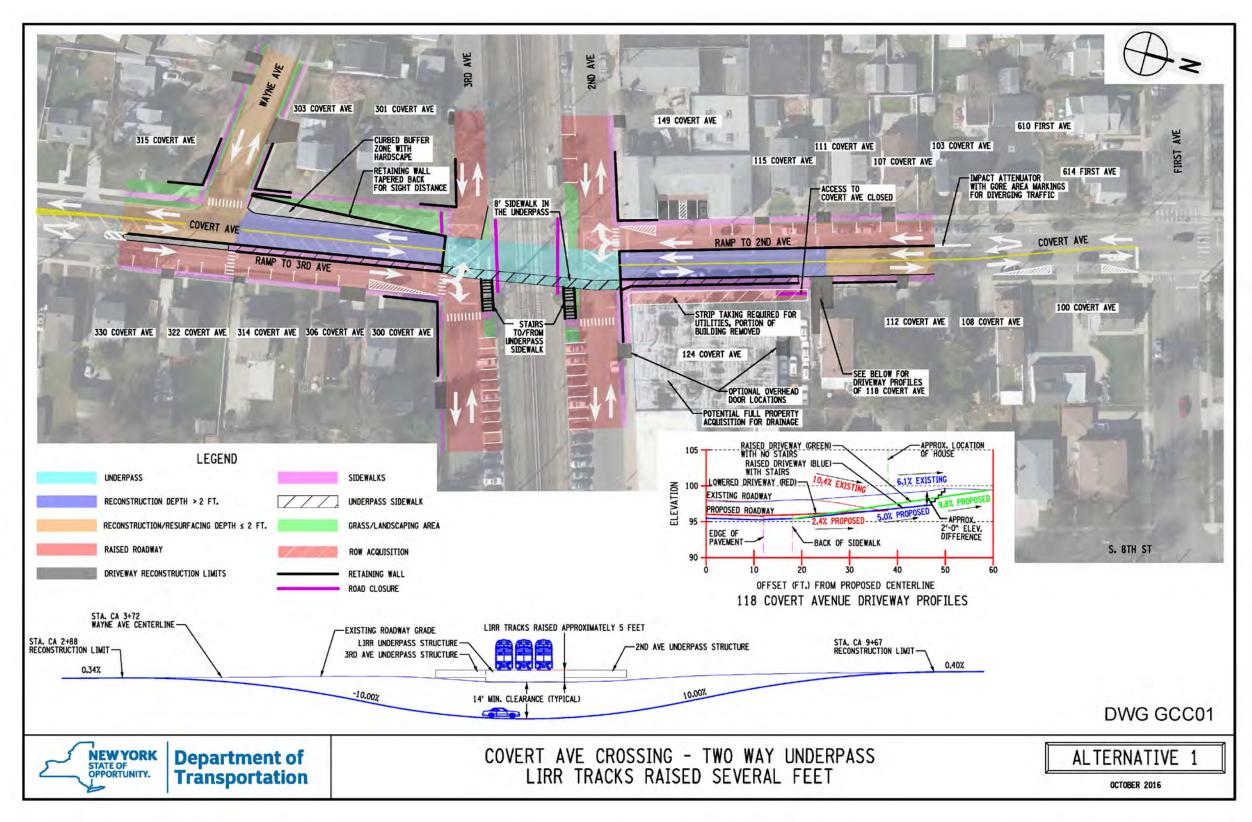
Covert Avenue Crossing (Alternative 1: Two-Way Underpass – LIRR Tracks Raised Several Feet)
